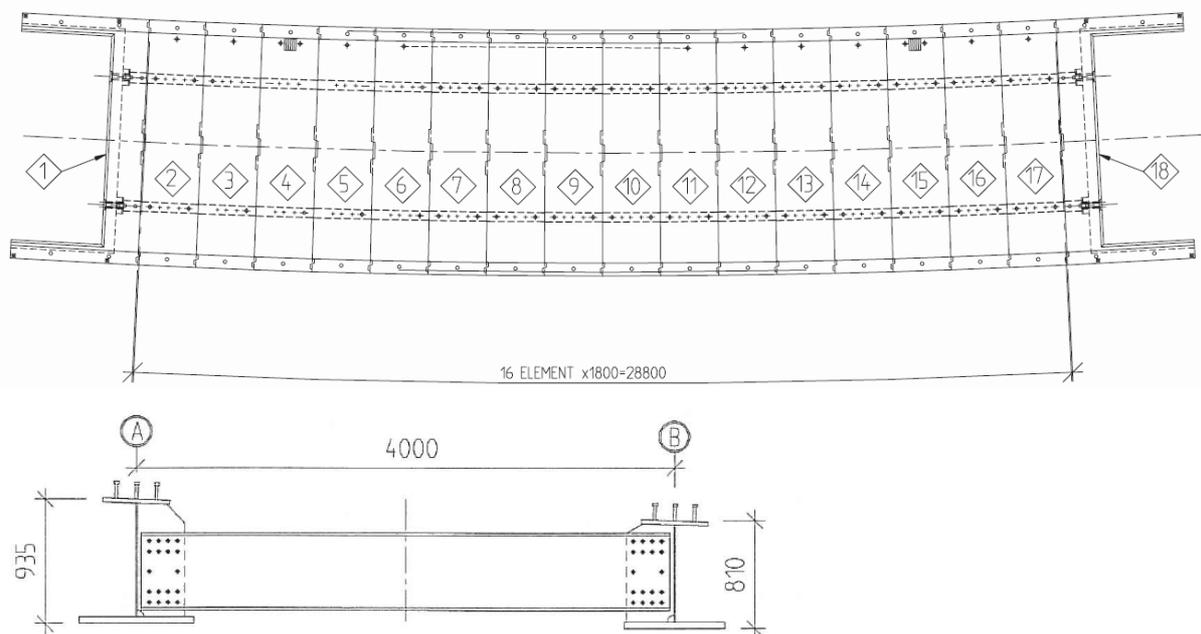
Plan and cross section of the prefabricated bridge. Elements 1 and 18 are the prefabricated back walls/end screens.
